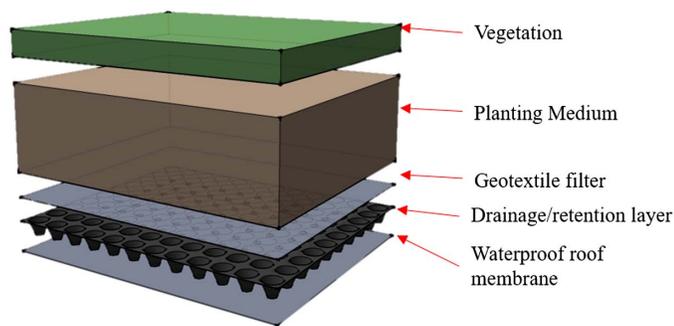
Typical layering of a built-up extensive green roof system illustrating the drainage layer, geotextile, soilless planting medium, and vegetation layers
